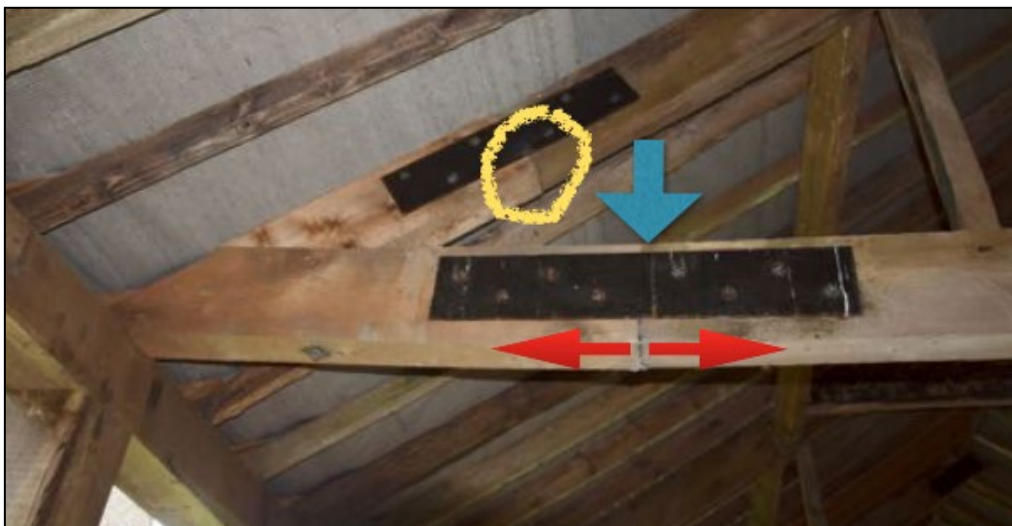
The repair plates are ineffective, and the tie beams are bending. Also, the principal truss rafters are bending (Photo: Nicholas Warns Architects).
